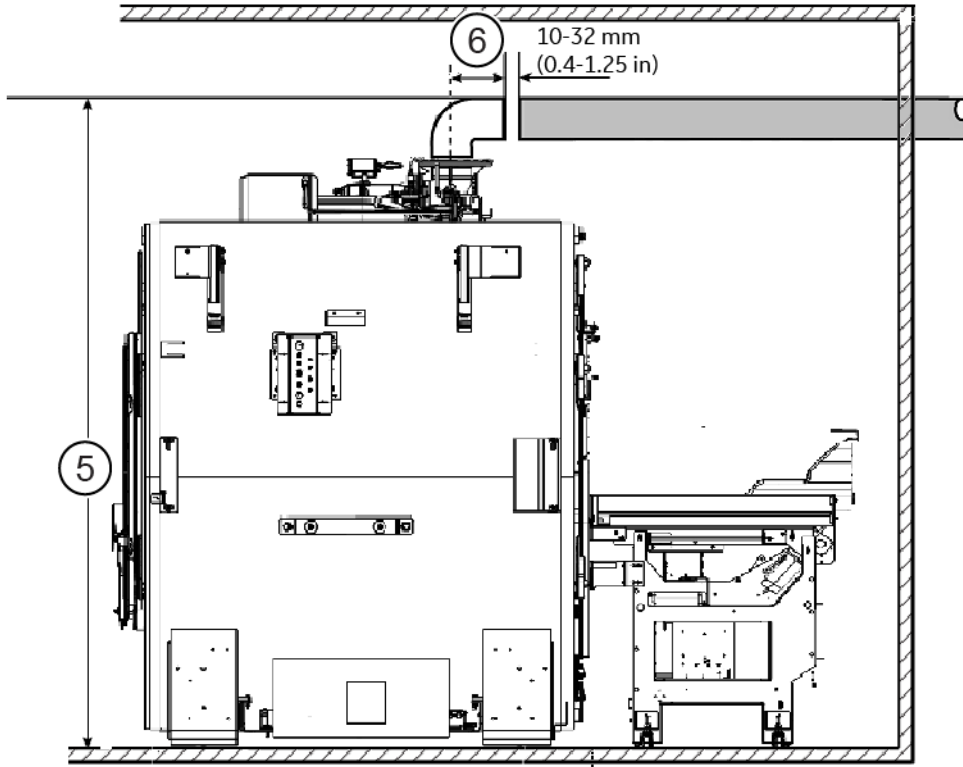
Dimensions of 90° Adaptor Side Exit
